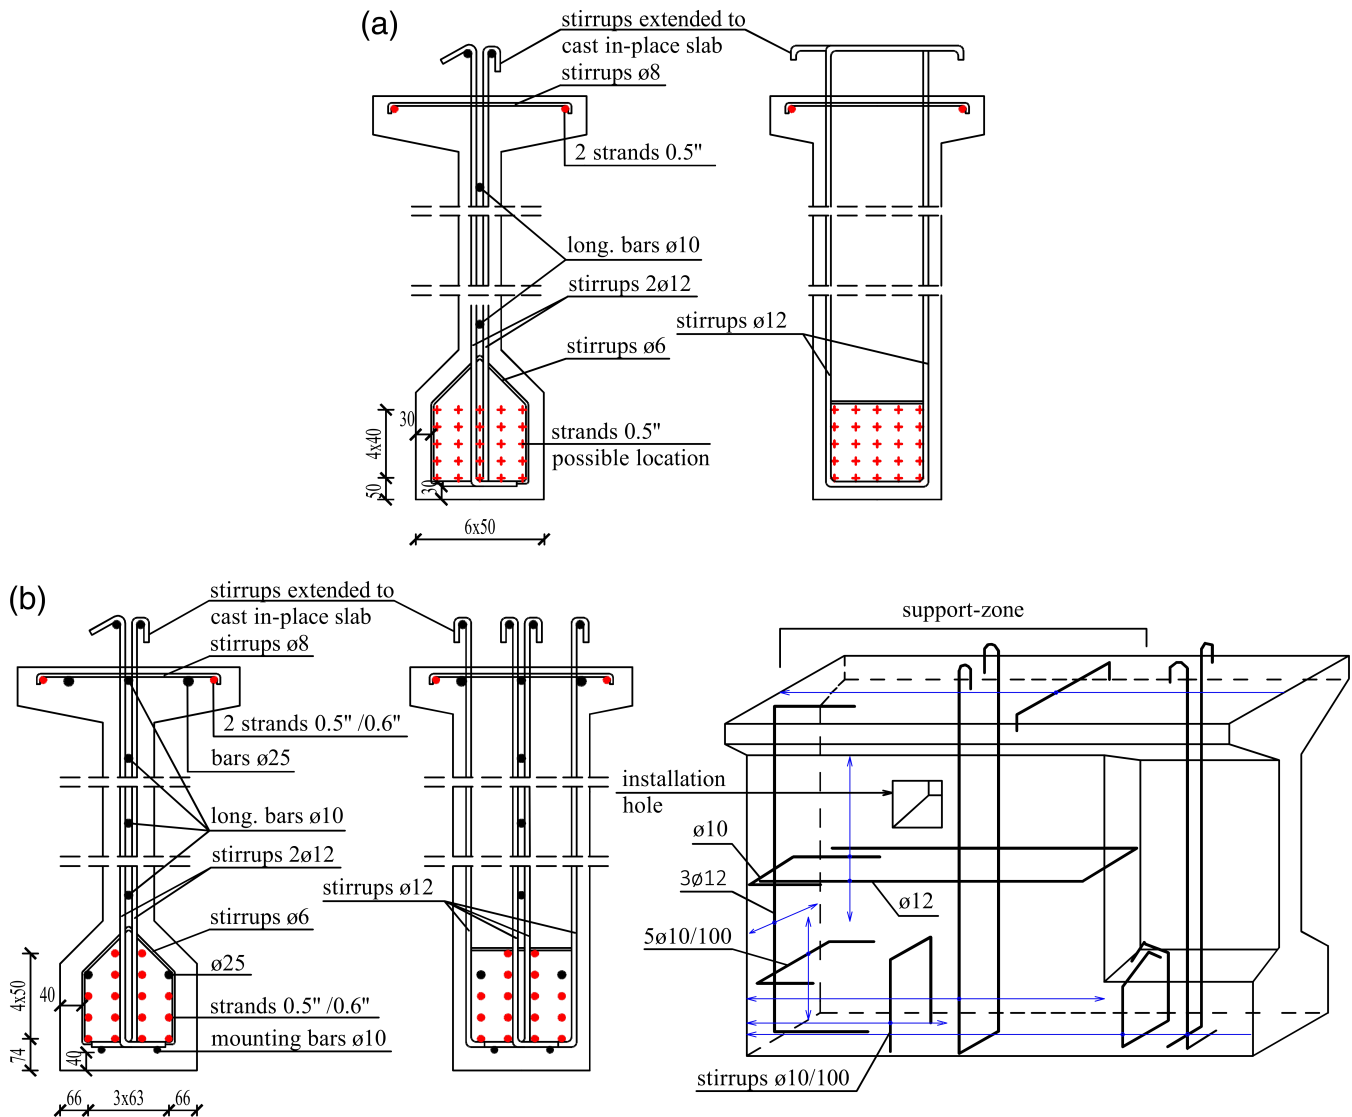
Typical reinforcement arrangements in NIB girders. (a) NIB 1400 from 1983.⁸ (b) NIB 1400 from 1989⁹
